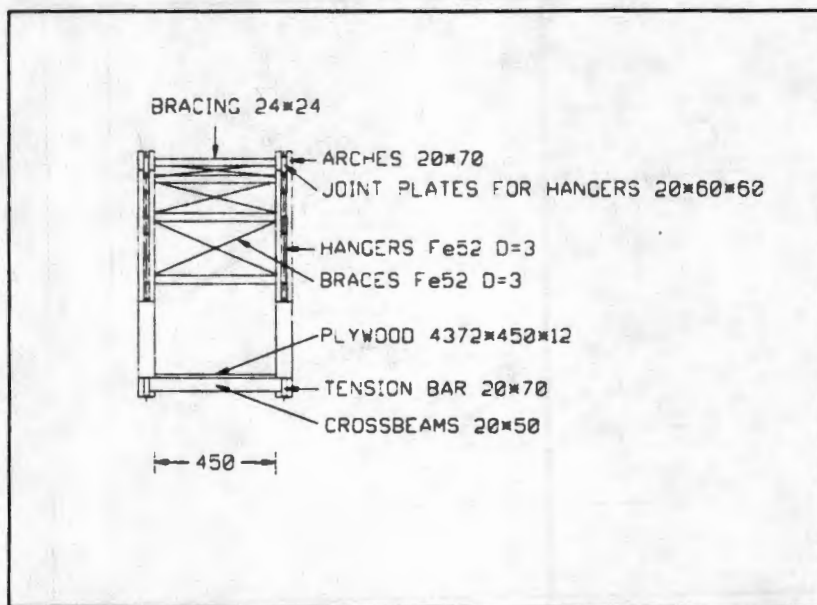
Cross-section of the arch model. Dimensions in millimetres.
